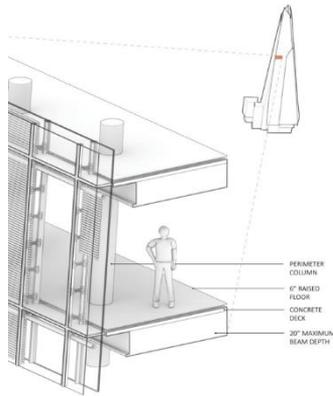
The Shard Facade, Triple Glazed Detail [7]
